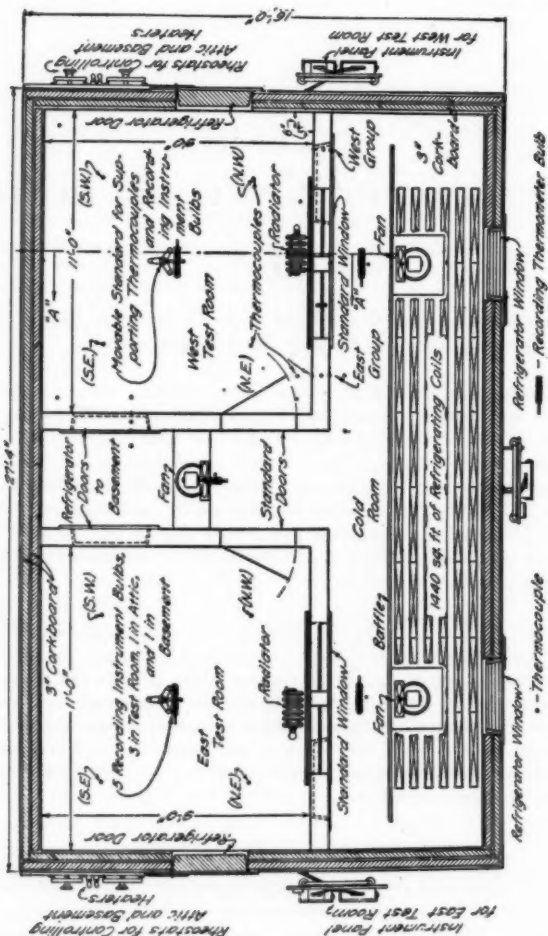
PLAN SECTION OF LOW TEMPERATURE TESTING PLANT
